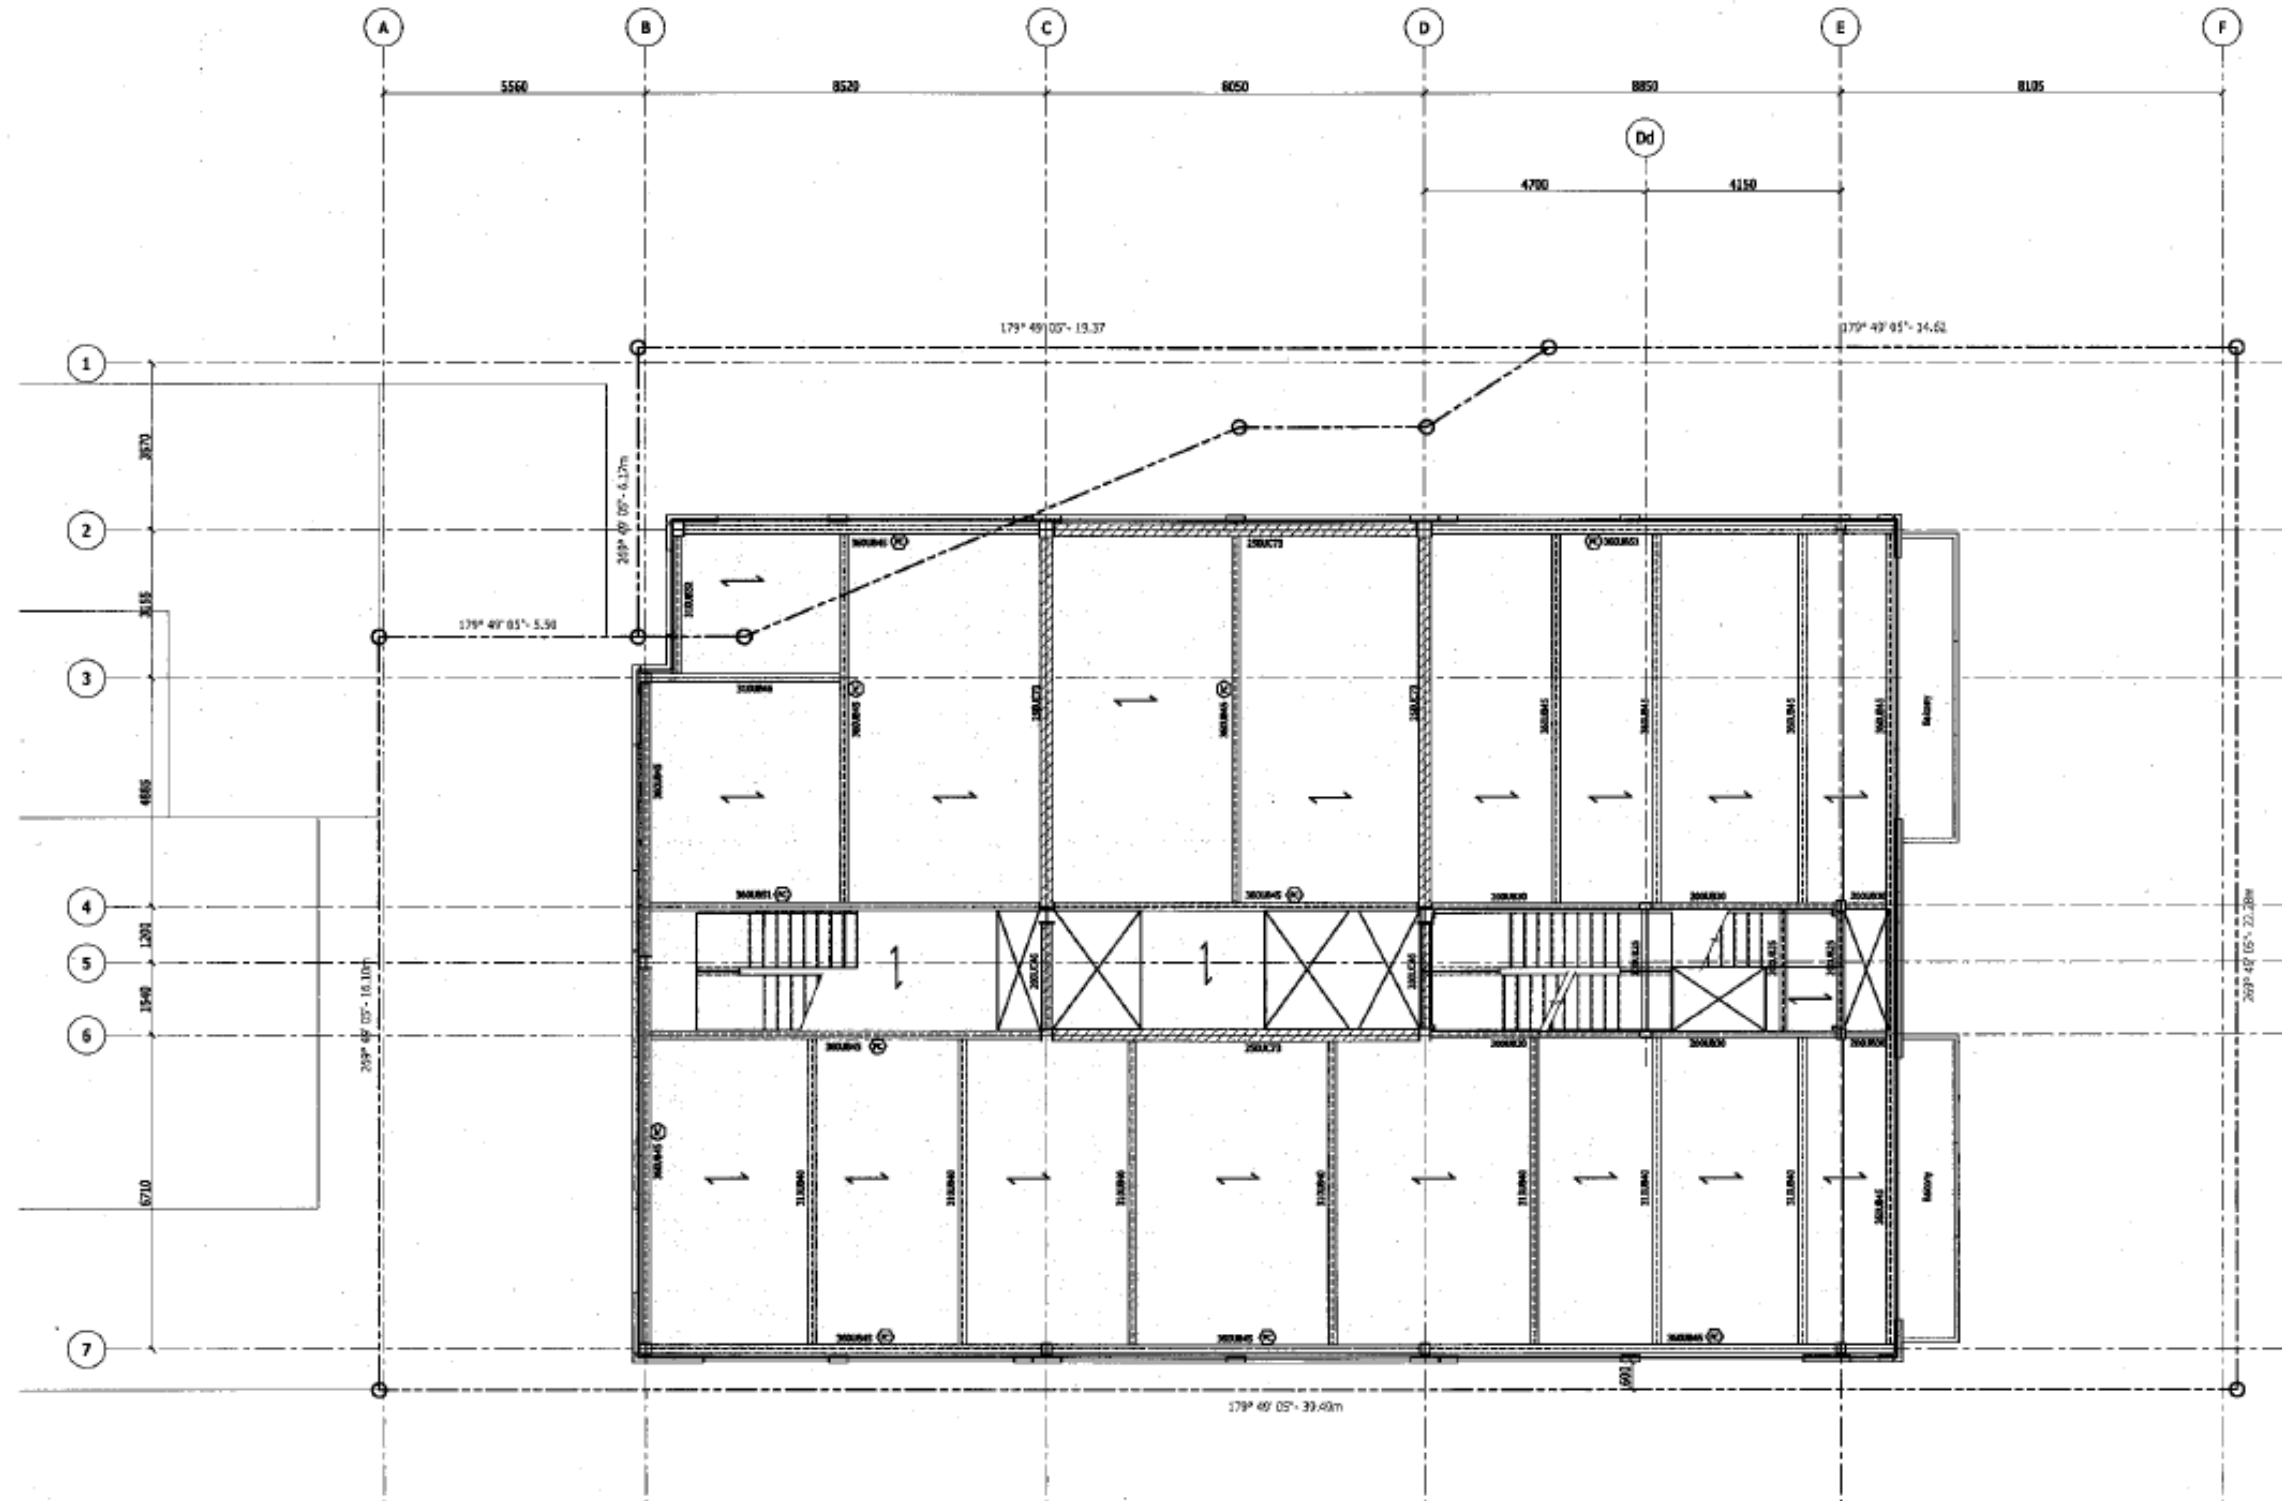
Structural Plan Level 20 (Christchurch City Council 2016c)
